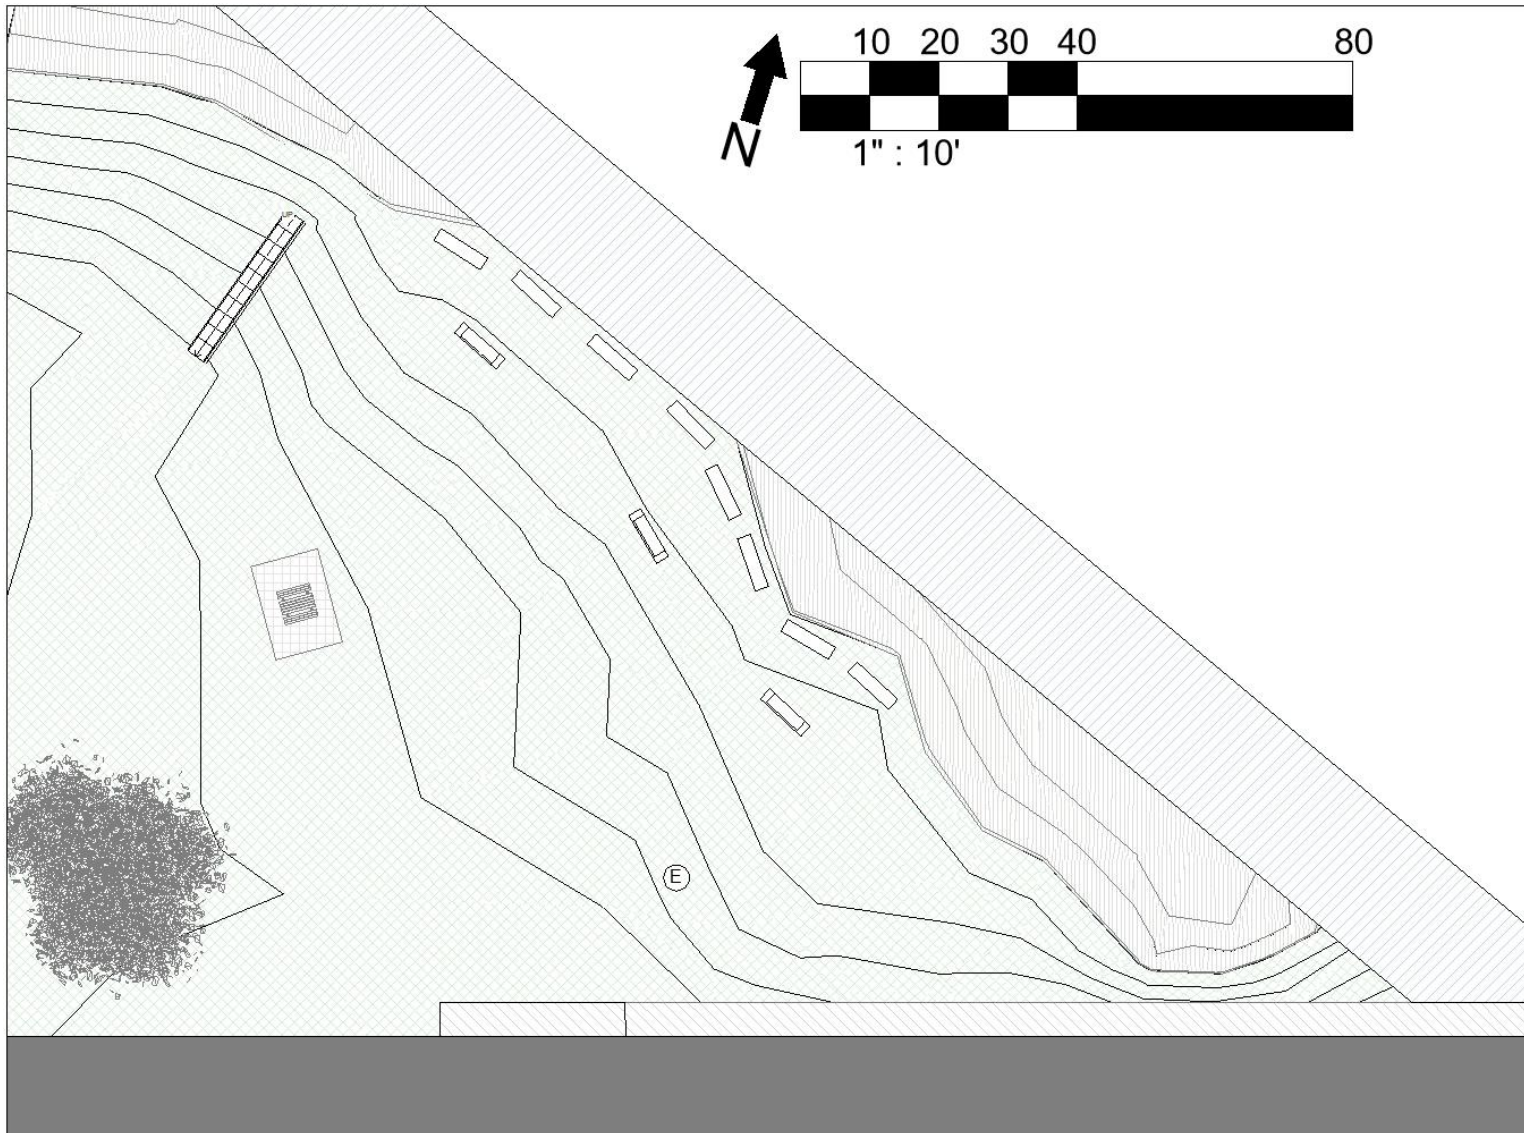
Site plan for the W Marion St. Site with 3 new benches and 8 limestone blocks to create a lookout point overseeing Shelly Park and the skyline as well as a new limestone staircase with a handrail for safety.
